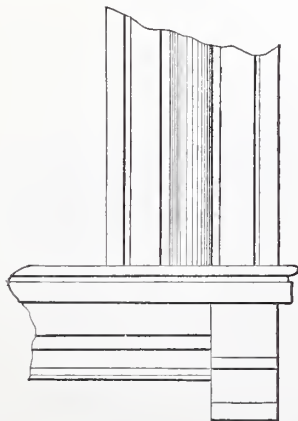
Window Stool and Trimming.—Scale, 2 Inches to the Foot.
